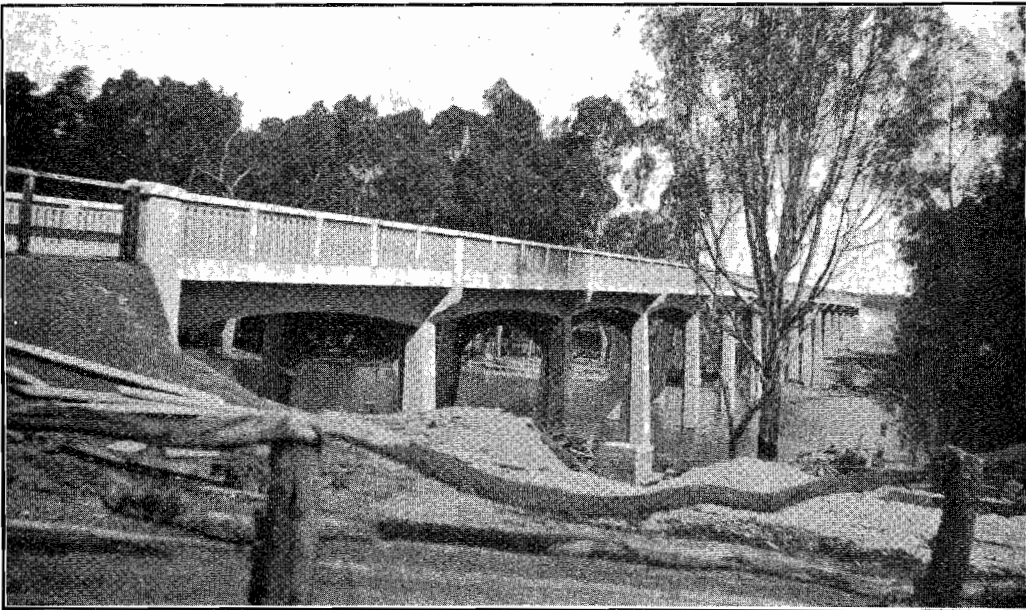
Reinforced Concrete Bridge over Loddon River at Eddington.
